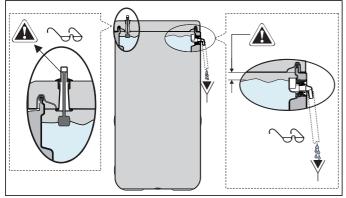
Filling the buffer storage tank - with KFE filling connection
